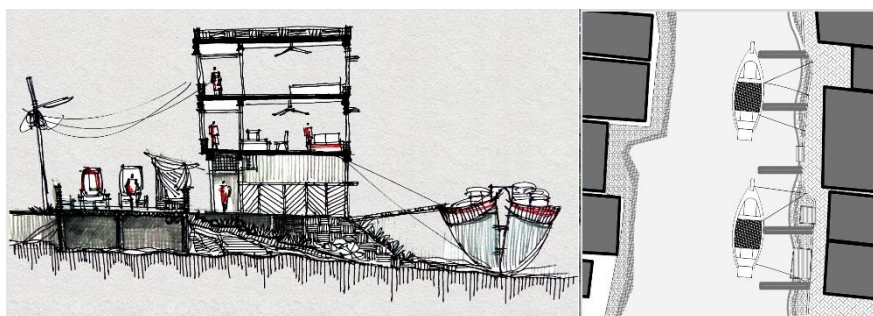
, Illegal structures limiting pedestrian circulation (Source: Author)
